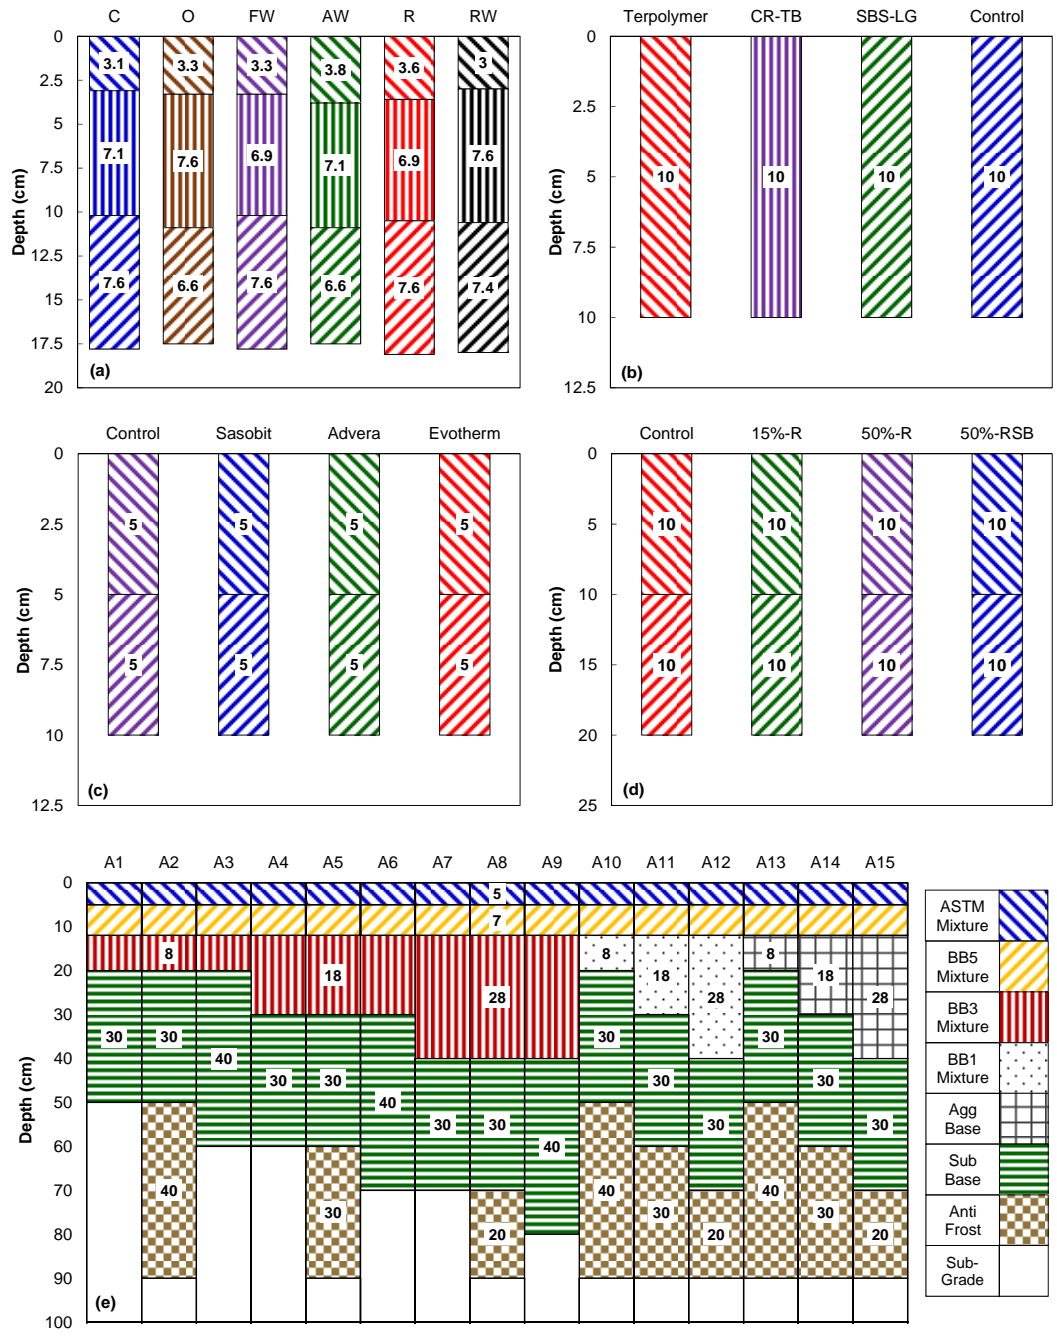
Schematics of asphalt pavement structures for the test sections: (a) NCAT (asphalt layers), (b) FHWA-ALF (asphalt layers), (c) MIT-WMA (asphalt layers), (d) MIT-RAP (asphalt layers), and (e) KEC (whole pavement structure).
